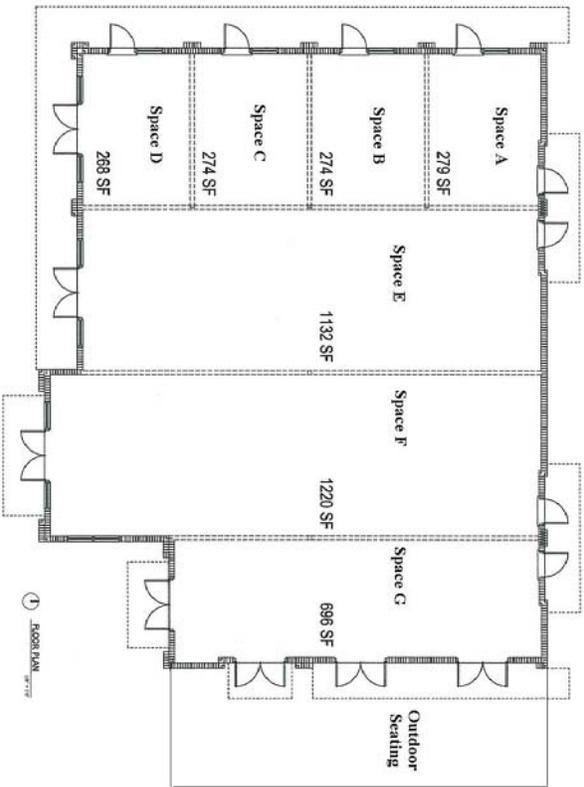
Ground Floor Plan of future 731 Building (Rendering by Dorsky Yue Architects)
